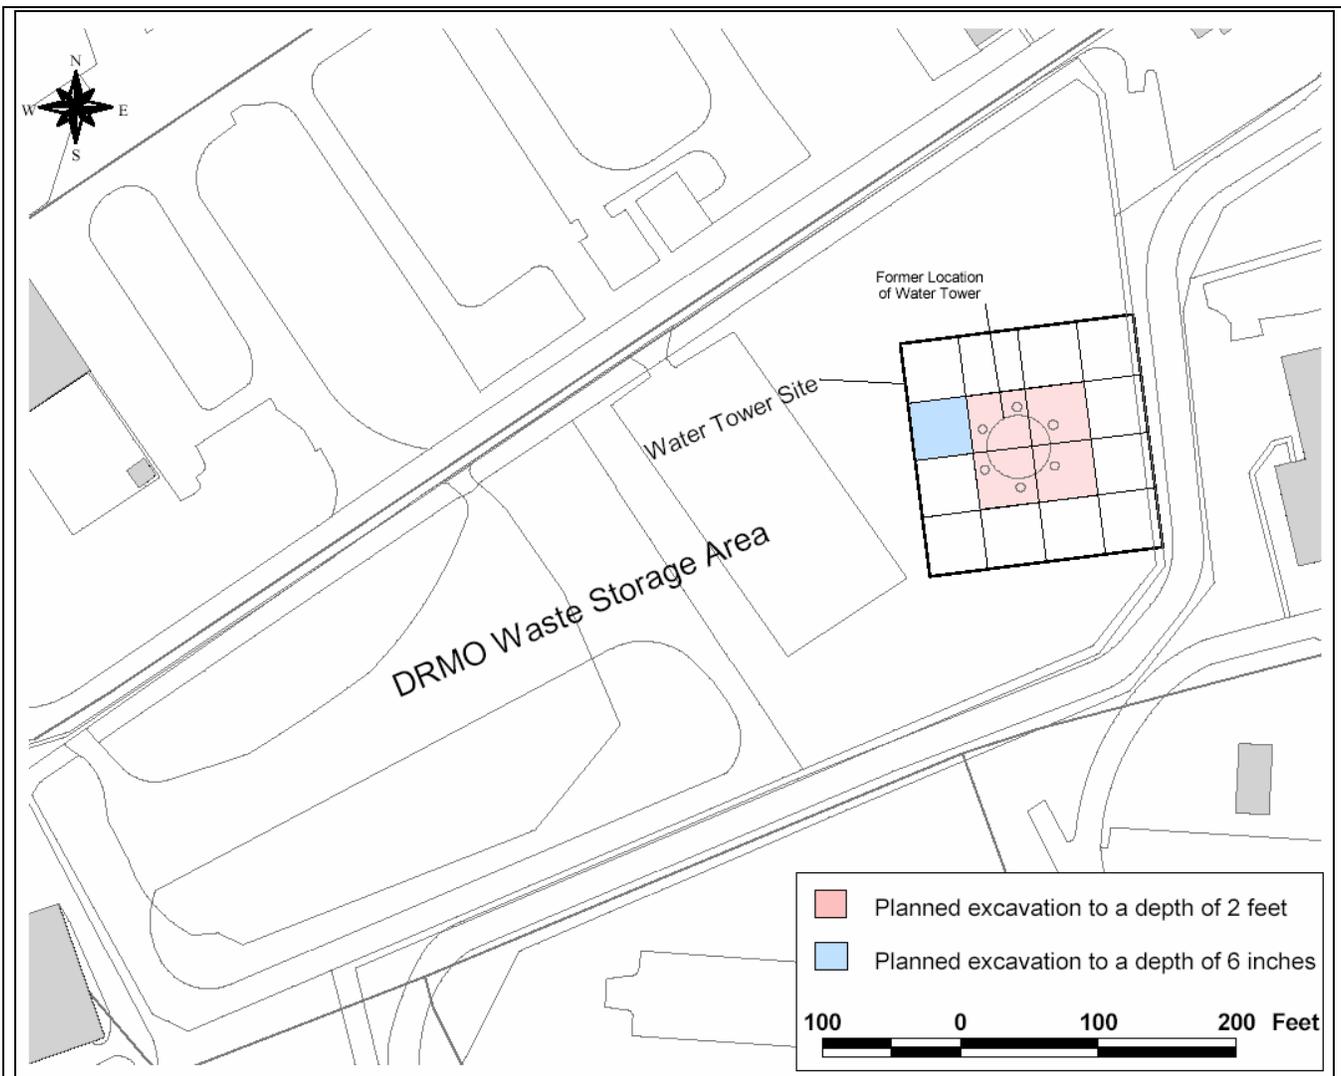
Truman Annex Former Water Tower Site and Planned Excavation.
